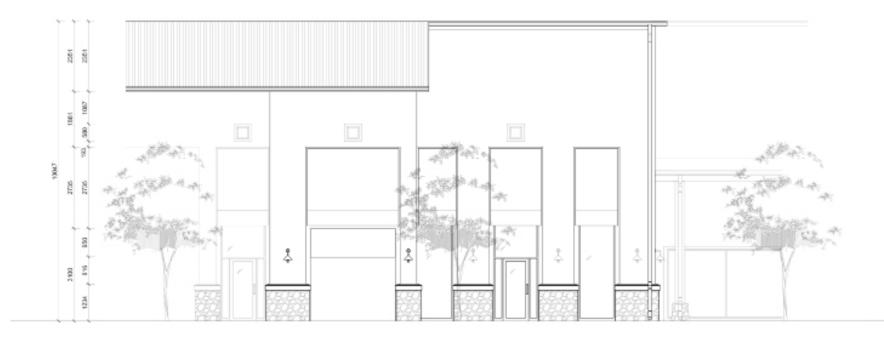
Shop 150 Existing facade (Author, 2016).
